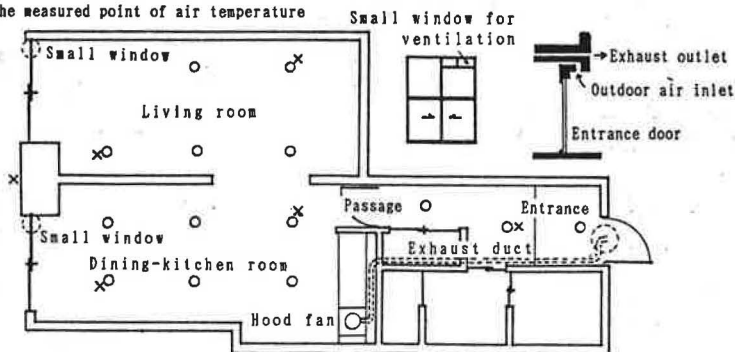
The plan of the experimented house and the location of installation for ventilation
